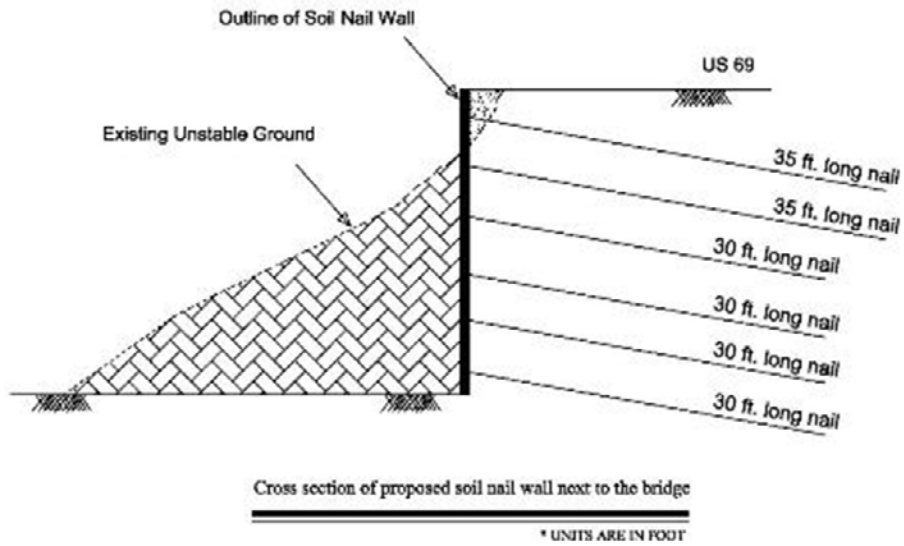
Proposed Soil Nail Wall to Stabilize the Unstable Section next to the Bridge.
